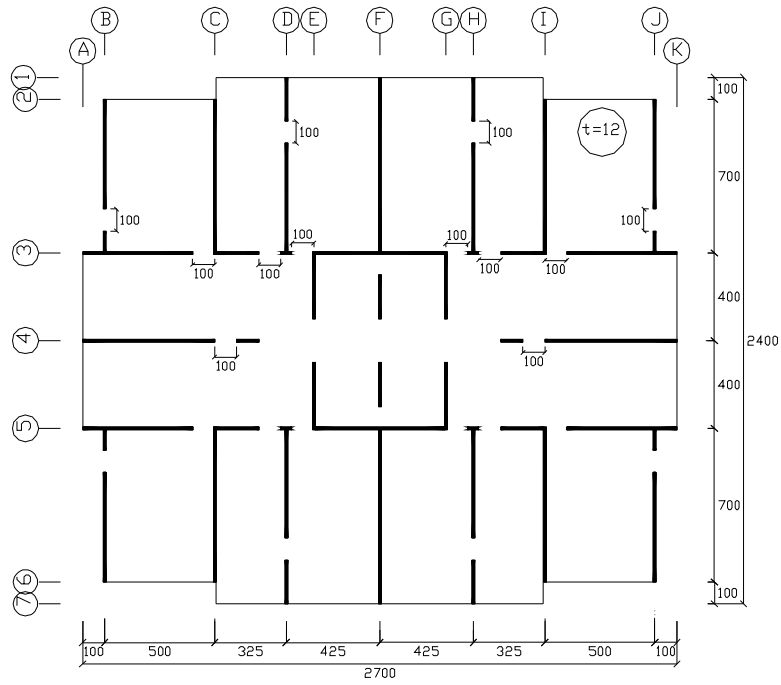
Typical plan view – Plan No. 15 (units in cm)
